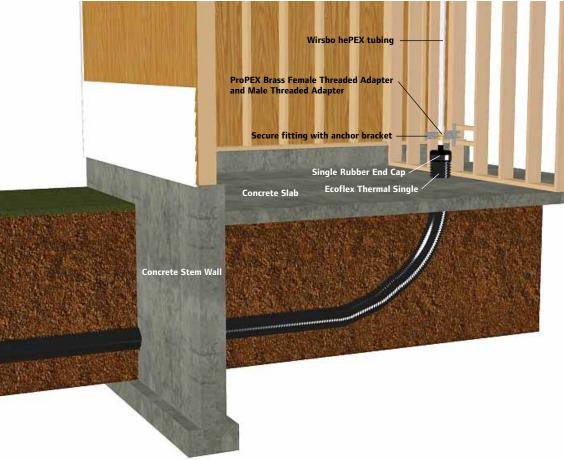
Slab-on-grade Through Sleeve Installation – Interior Wall Attachment
